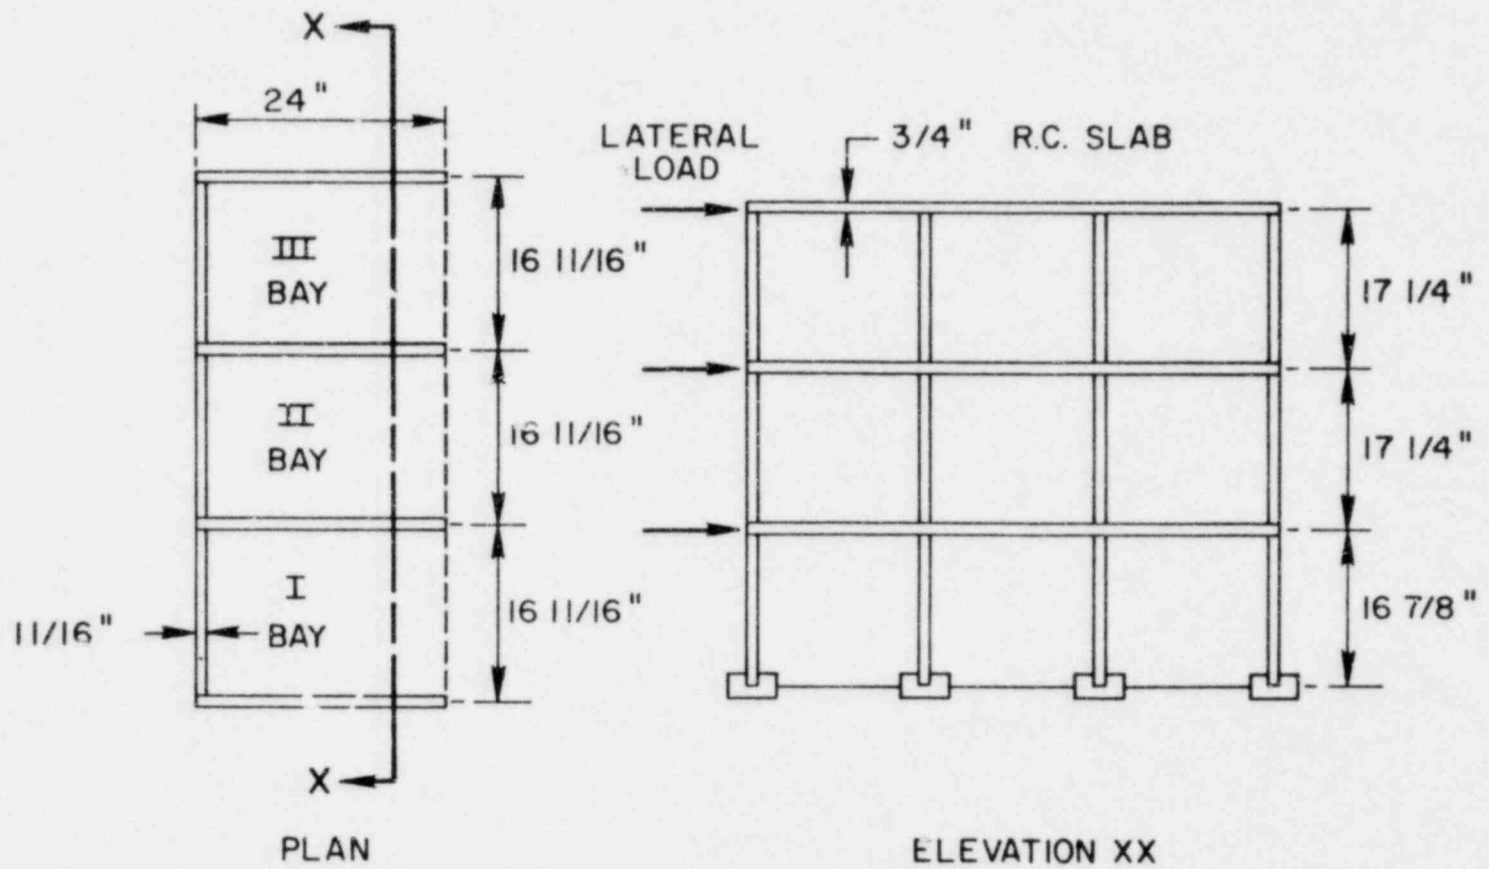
ONE-SIXTH SCALE MODEL TEST STRUCTURE
